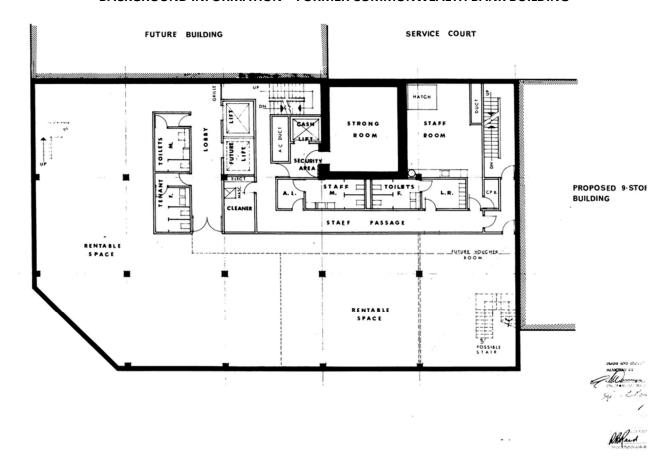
Former Commonwealth Bank Building, original upper basement floor plan
